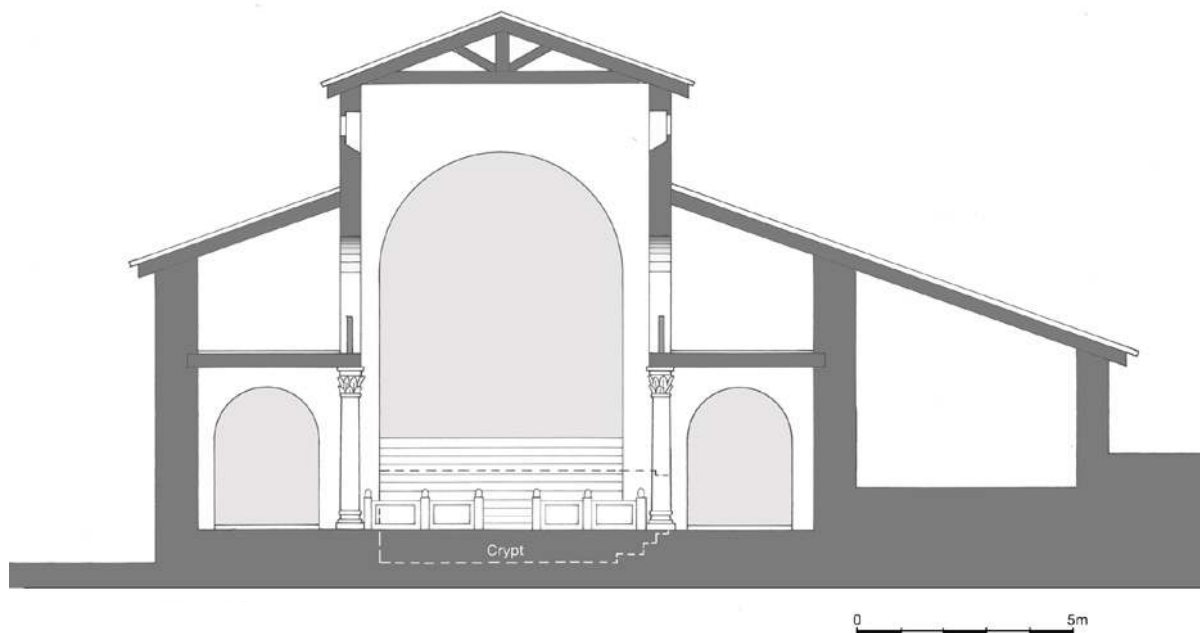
Reconstruction plan (N-S section) emphasizing elevation and illumination. Drawing by Leen Ritmeyer.
